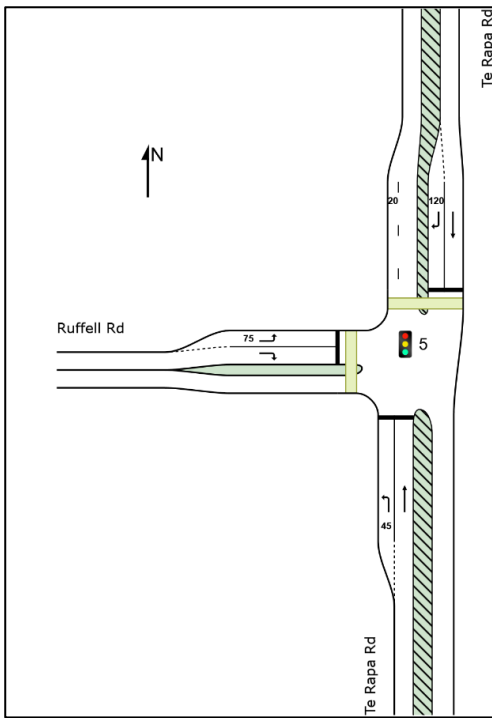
Existing Te Rapa Rd / Ruffell Road Signalised Intersection Layout
